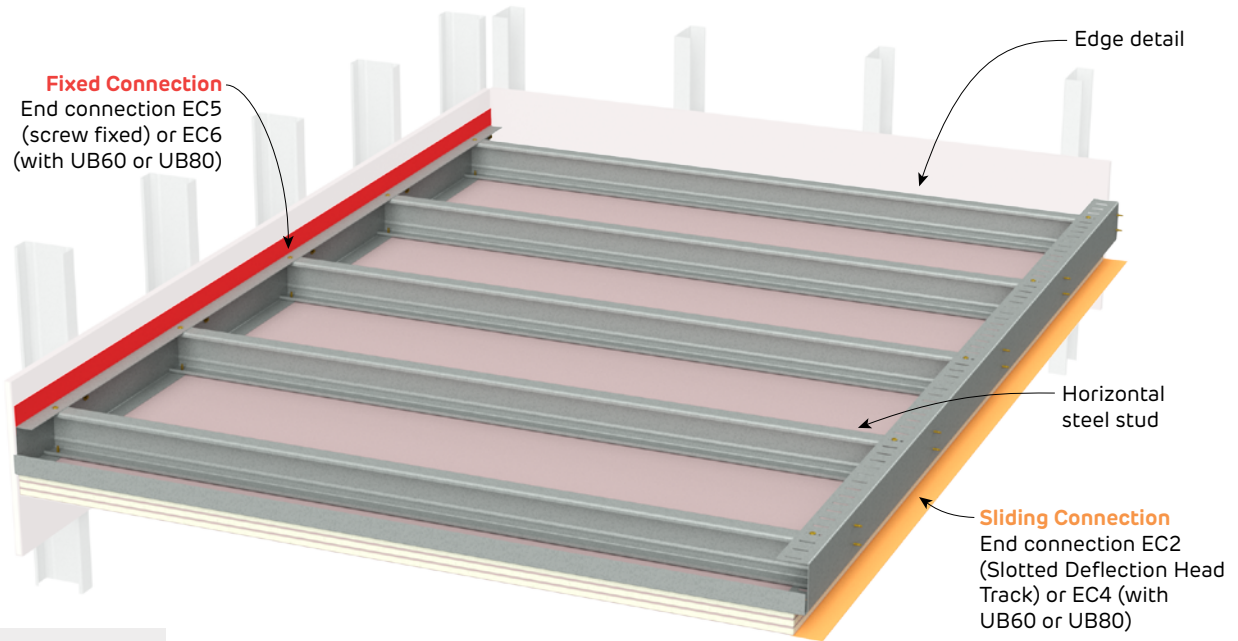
Stud Ceiling Type A1 - Edge Detail
